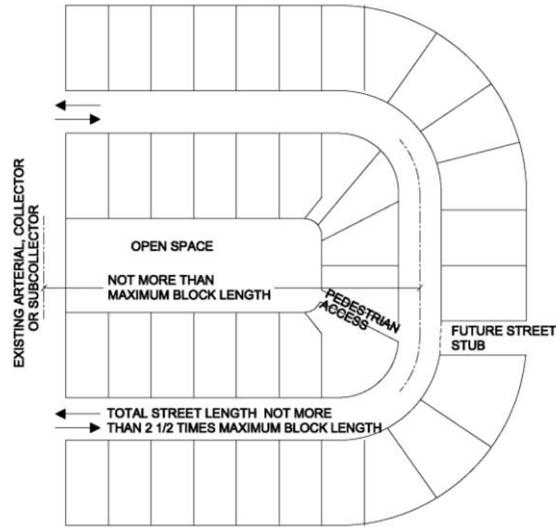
ONE ACCESS SUBDIVISION – CUL-DE-SAC
